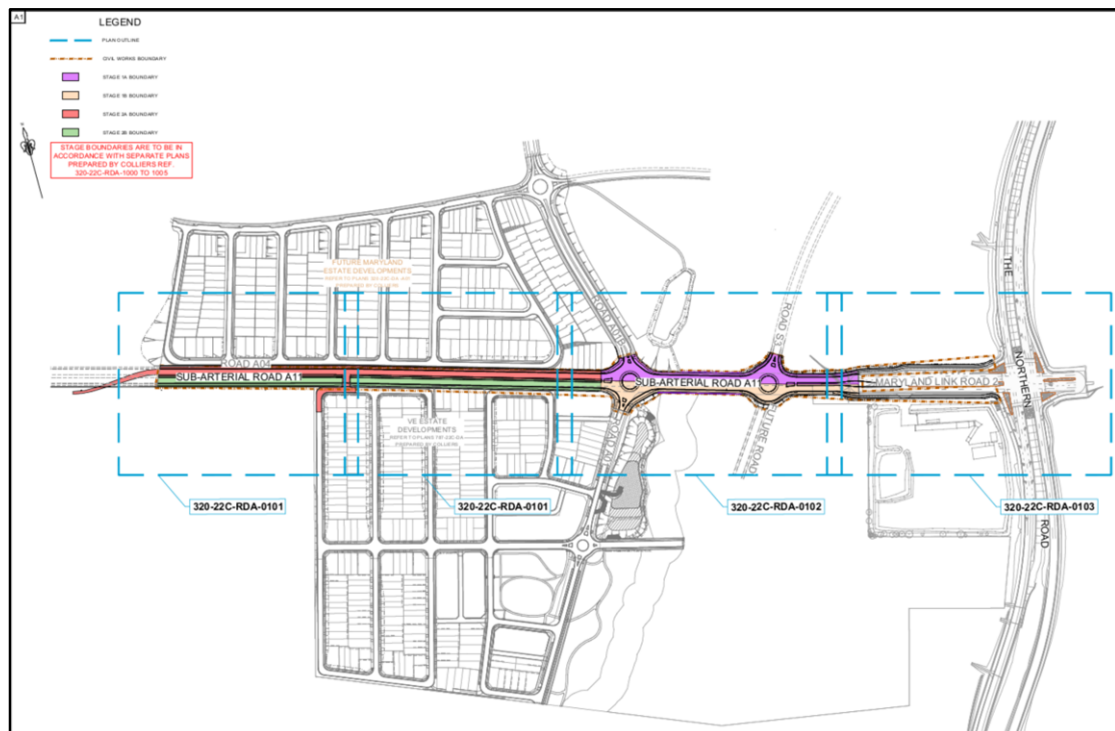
Site plan of proposed sub-arterial road construction subject to DA/2024/467/1.
